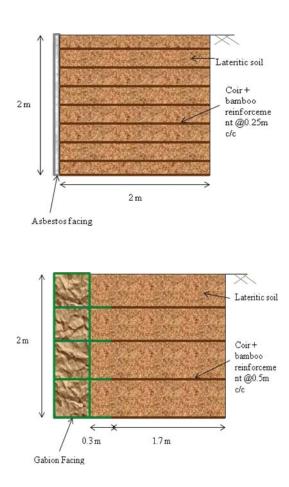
Cross-sectional view of the coir reinforced wall with thin panel facing (asbestos) and gabion facing.
